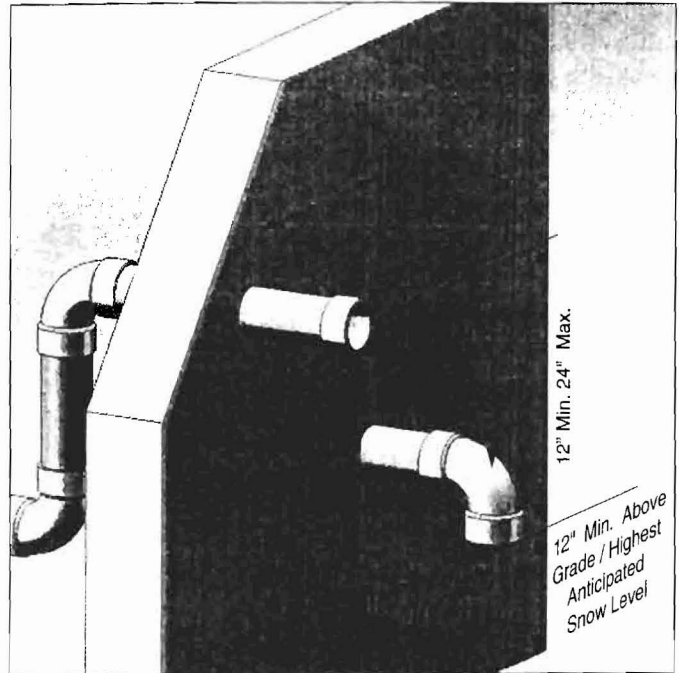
Direct Vent - Alternate Sidewall Termination of Vent and Combustion Air Piping
